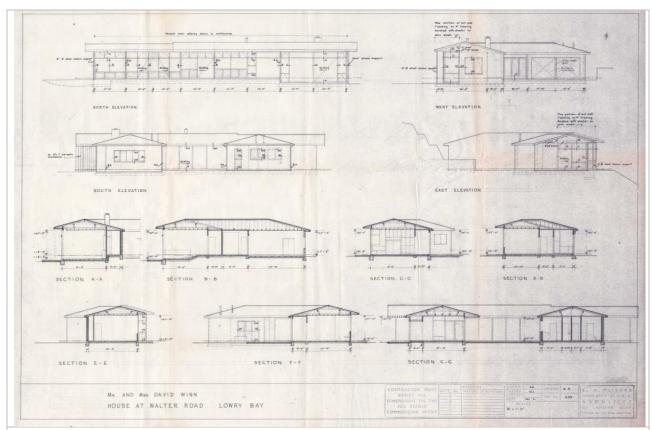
Original elevations for Winn House, dated 1961. Source: HCC Archives
